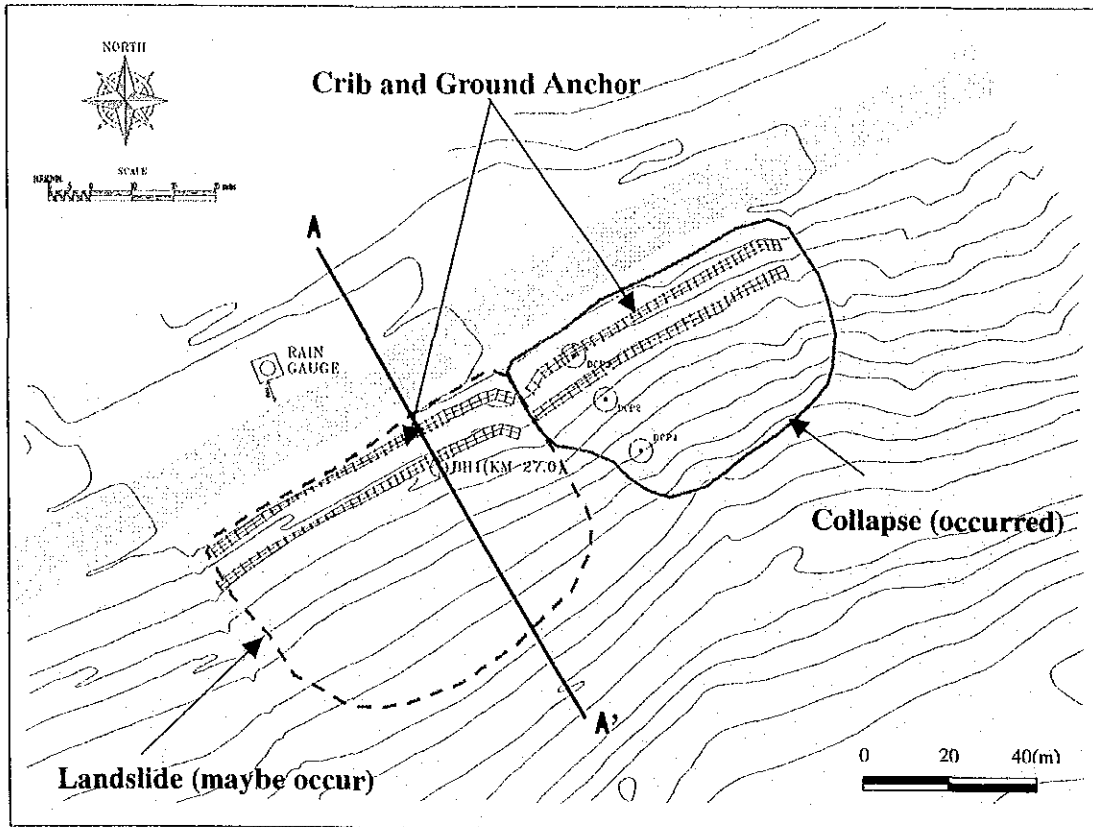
Plan of ground anchor works in CH 27.00 km
